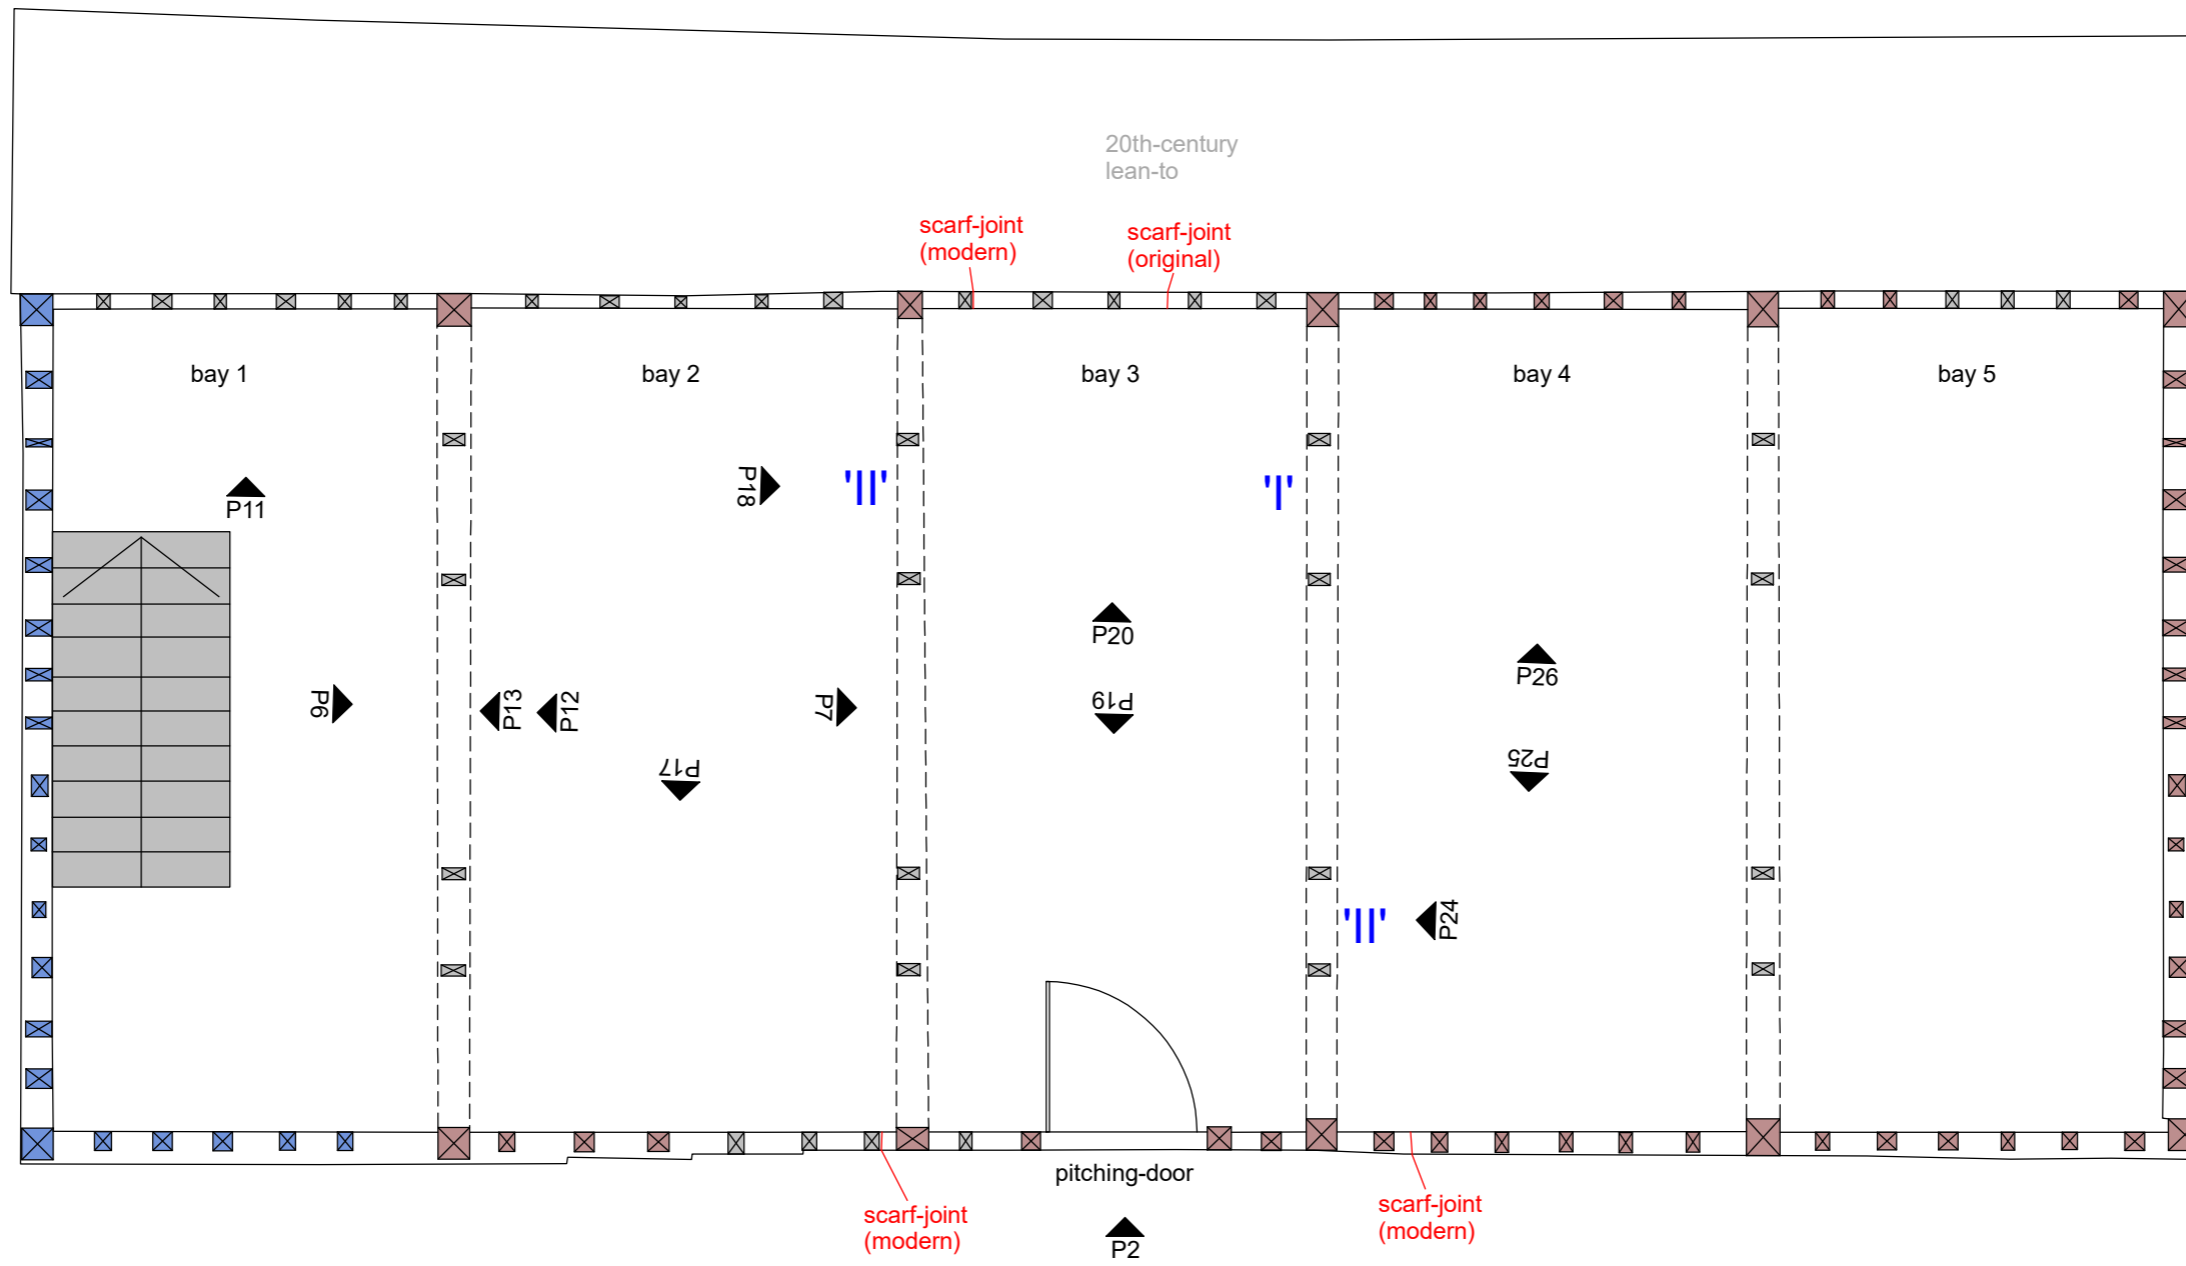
First-floor plan of building, showing phasing of timbers, scarf joints and location and direction of photographs reproduced in text.
